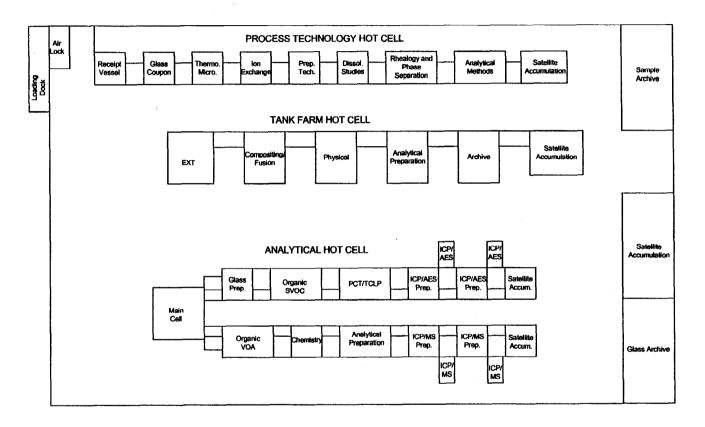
A-108 Analytical Laboratory Second Floor General Arrangement
